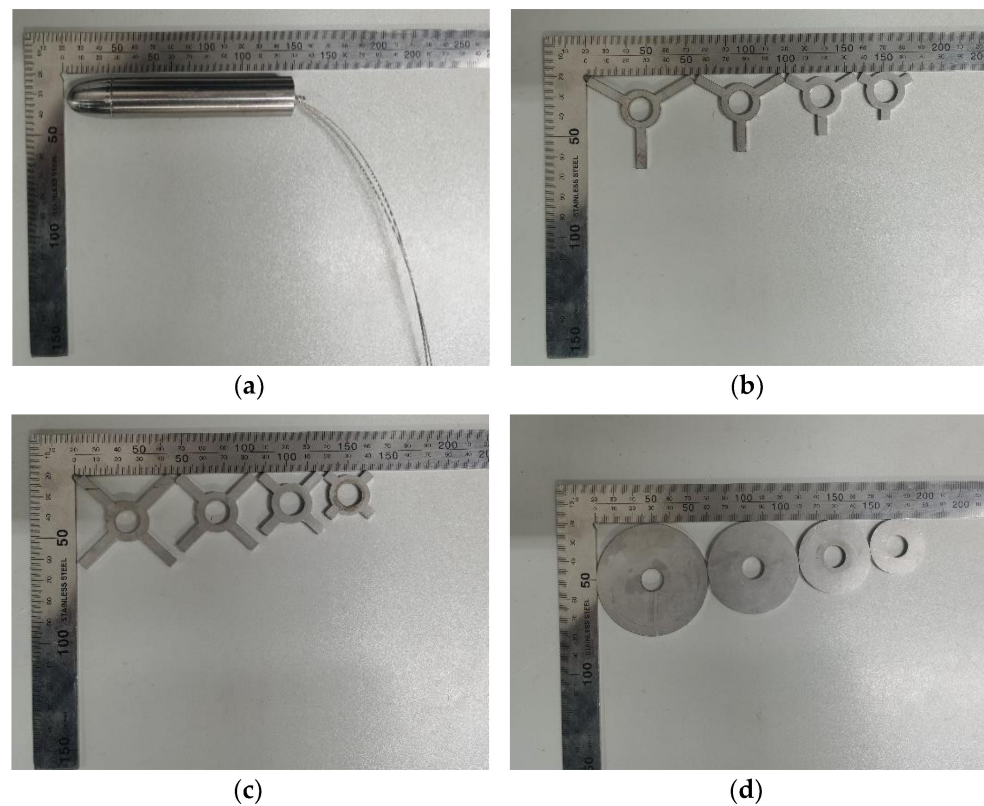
Torpedo anchor and bearing plate: (a) torpedo anchor; (b) EN3 type; (c) EN4 Type; (d) EC type.
